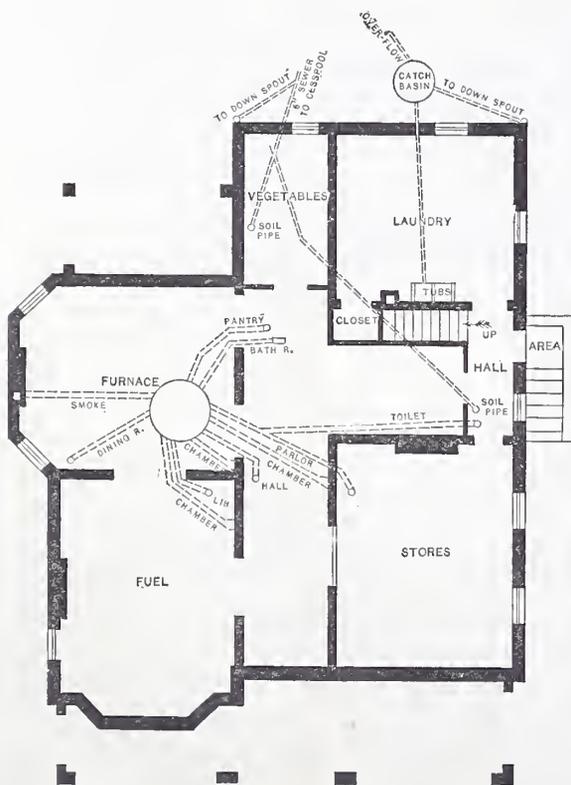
Foundation and Cellar Plan.—Scale, 1-16 Inch to the Foot.
